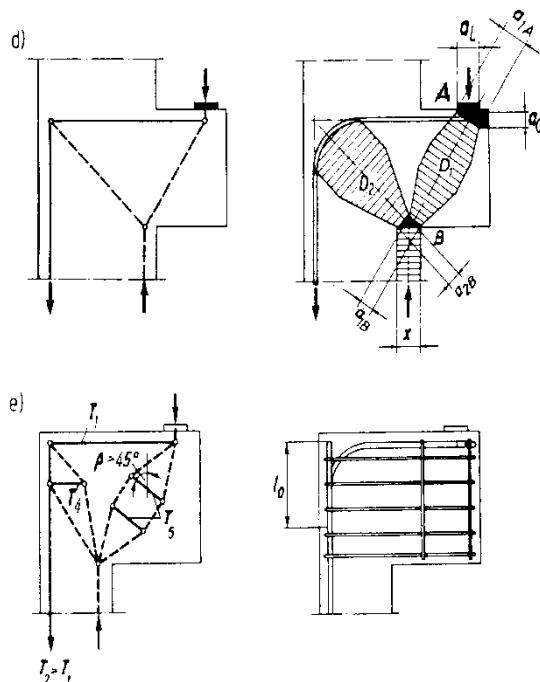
(continued) —Different Support Conditions Leading to Different Strut-and-Tie Models and Different Reinforcement Arrangements of Corbels and Beam Ledges (Schlaich et al., 1987)
